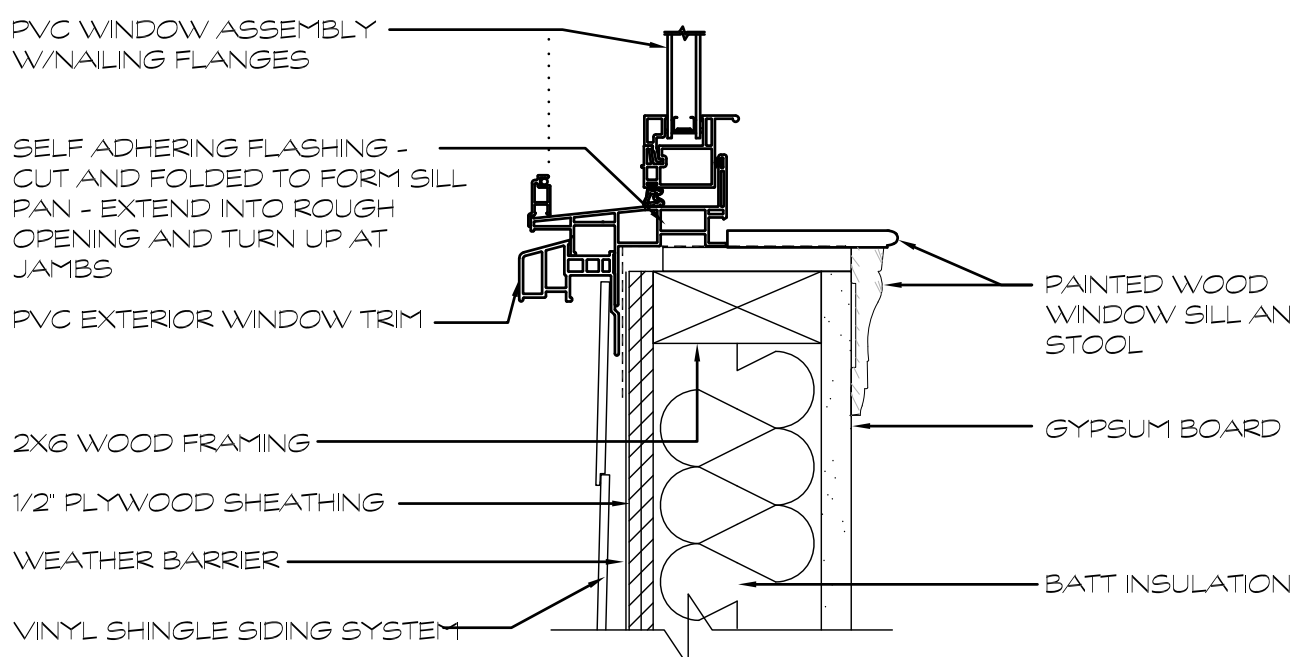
DETAIL - WINDOW SILL TO HEAD (TRANSOM BAR)
